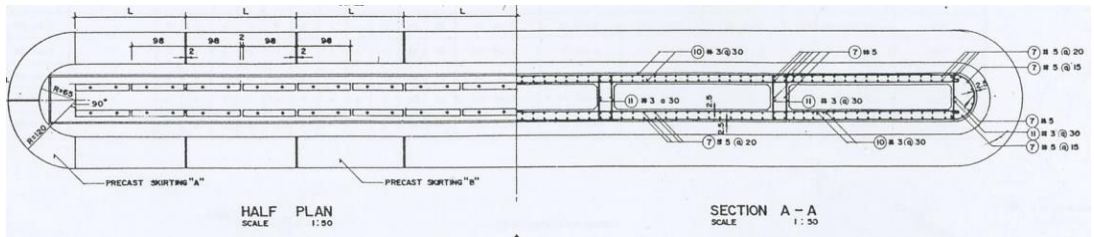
Top view of elastomeric bearings and shear dowel and reinforcement of pile caps (DOH, 1994)
